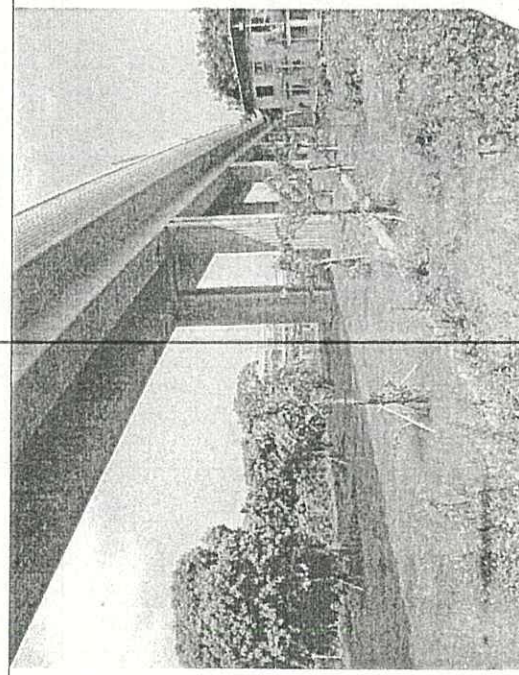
Landscape Planting at Lam Tei (Piers 49-52)
